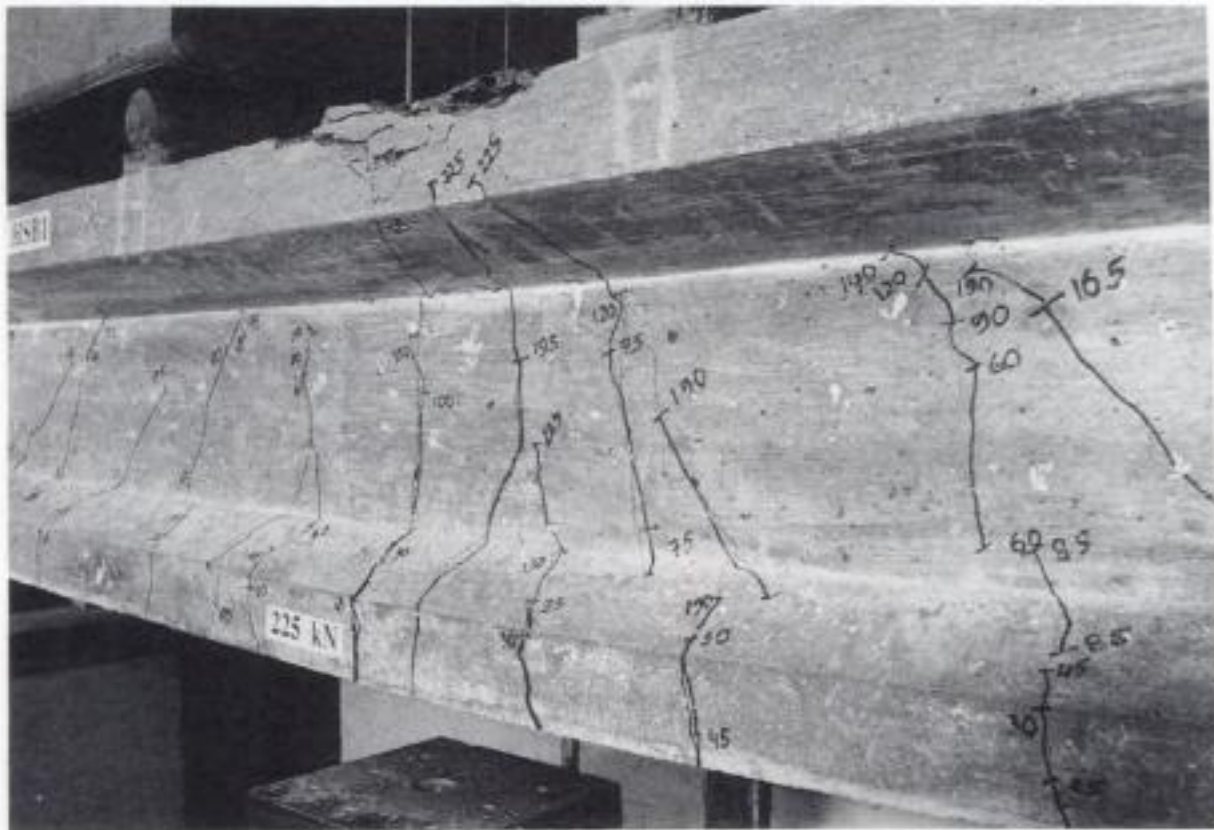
(facing and above). Beam C (25 brick elements). Crack patterns and deformed shapes at various load stages¹⁷³
